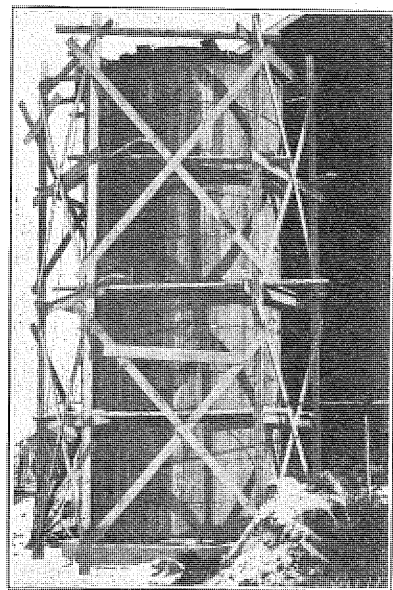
COMPLETE SCAFFOLDING FOR A STAVE SILO
